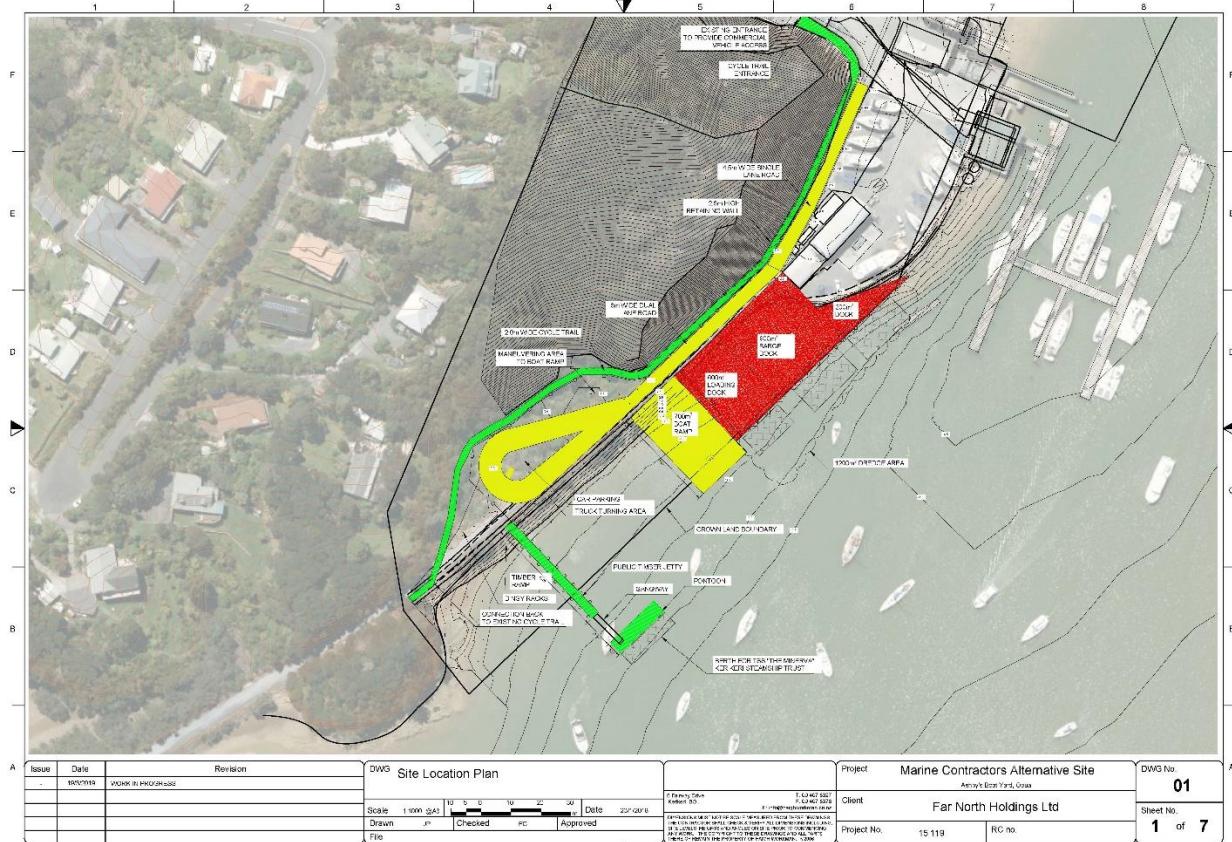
Development layout and site location plan of proposed maritime servicing area at Ashby's Boatyard, Opua.
